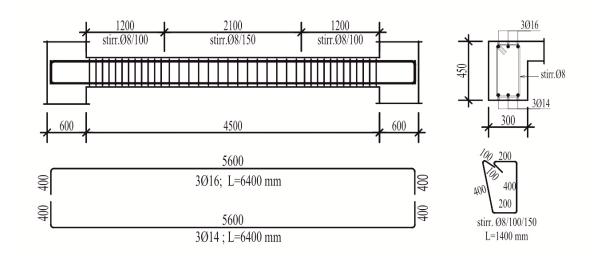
The geometric characteristics of the reinforced concrete beam (dimensions in mm)
